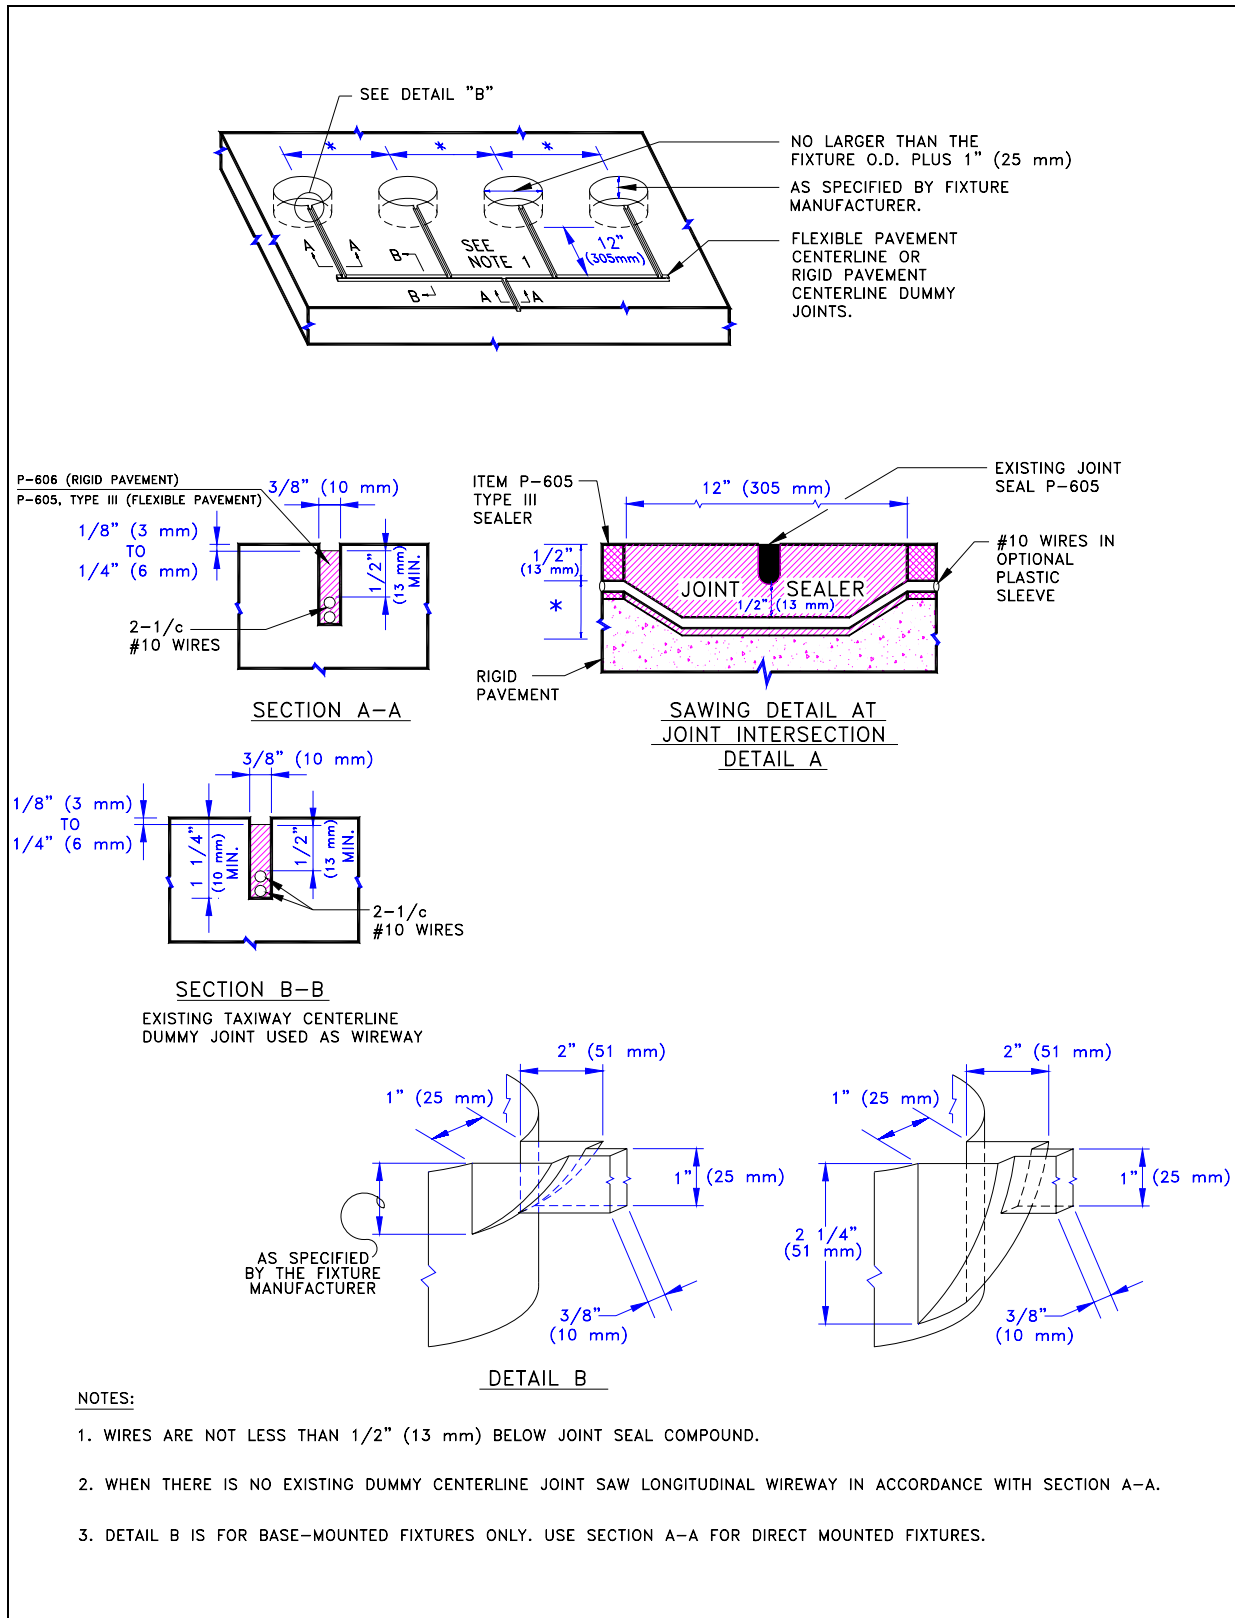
Sawing and Drilling Details for In-Pavement Taxiway Centerline Lights.
